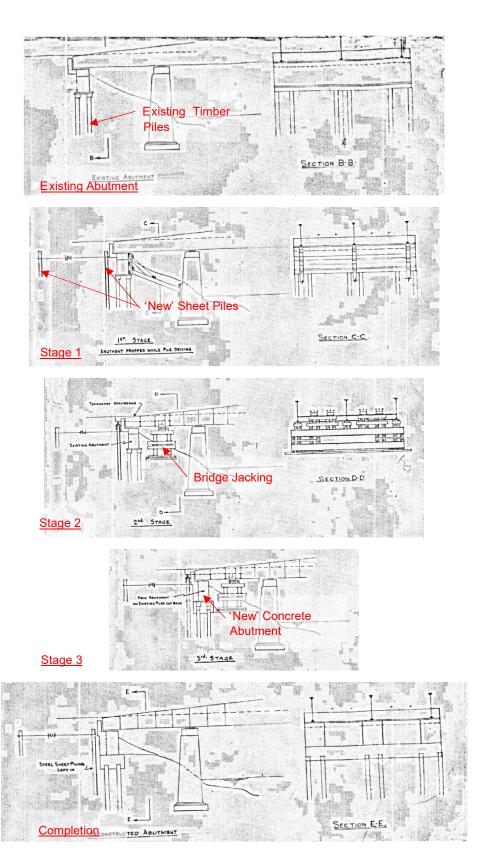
Proposed Abutment Reconstruction Extracted from Record Drawing
